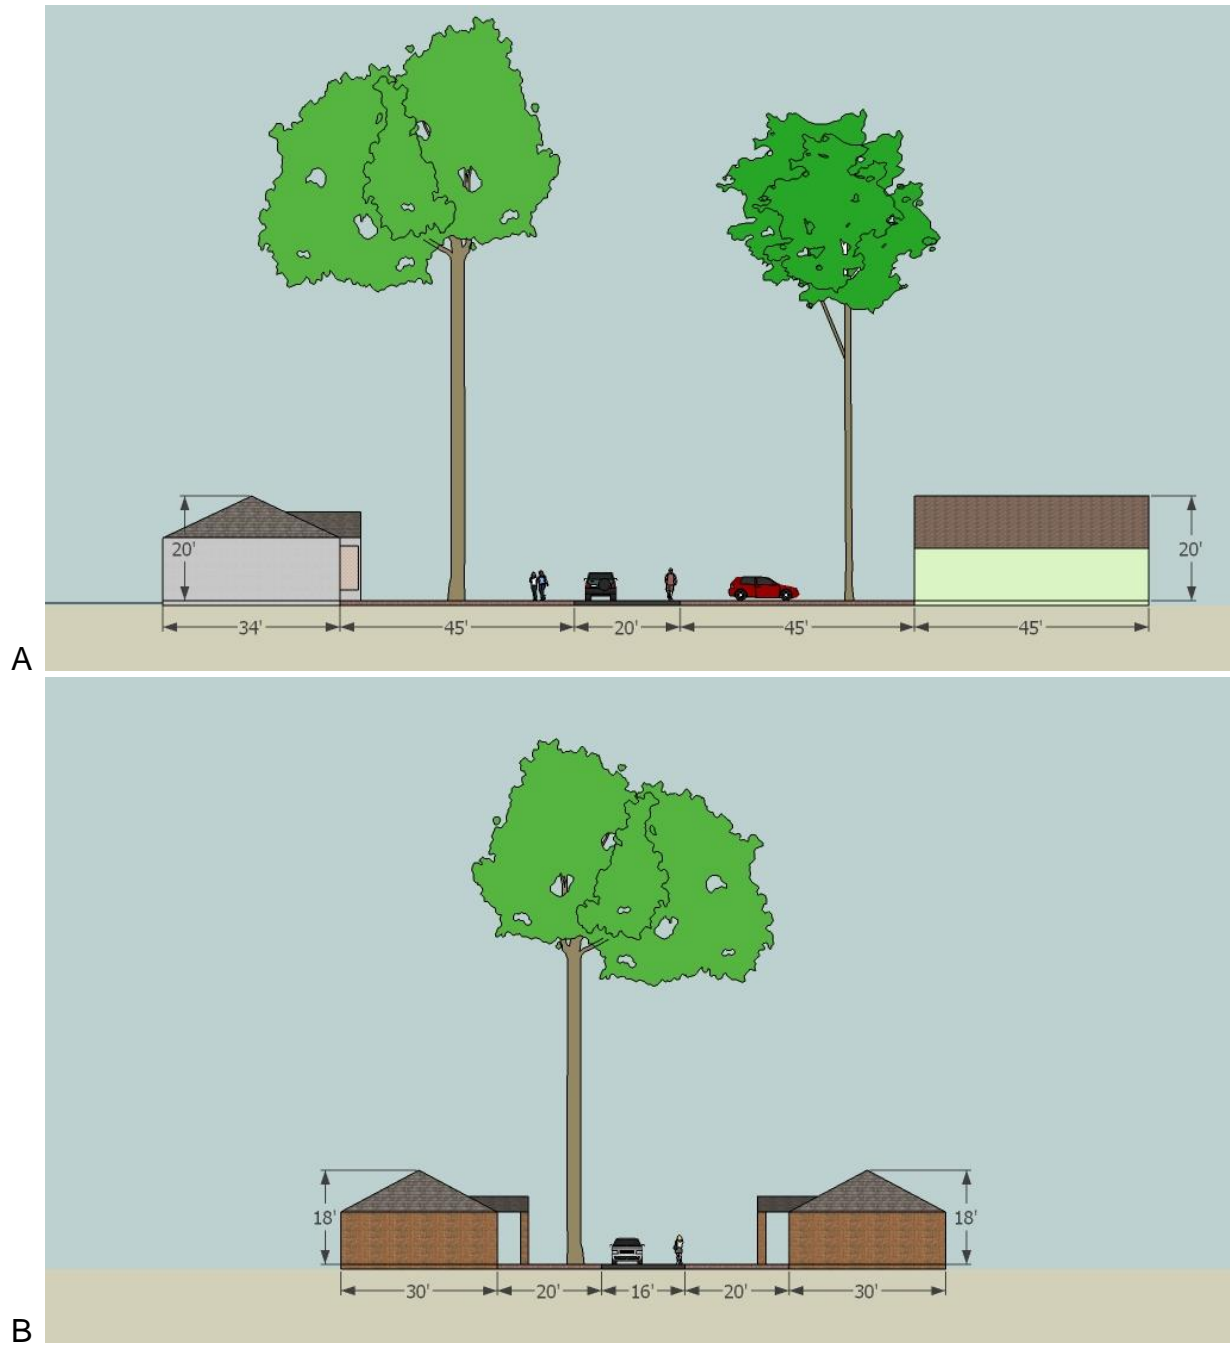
Section profile of College Park street geometry. A) NW 15th Street. B) NW 13th Terrace.
